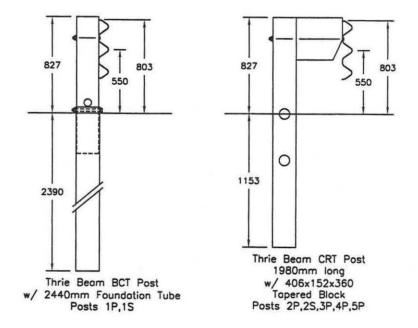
Post Assembly Detail, Simplified Short-Radius Guardrail System
